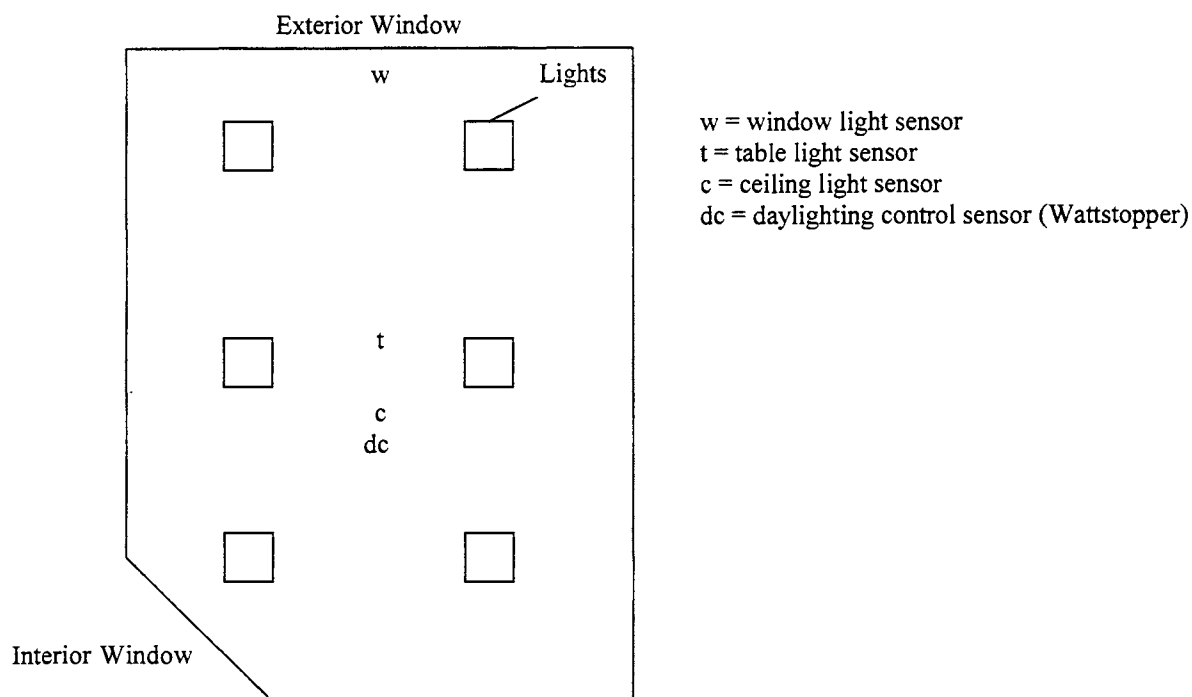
Light sensor layout for typical “A” test room (not to scale).
